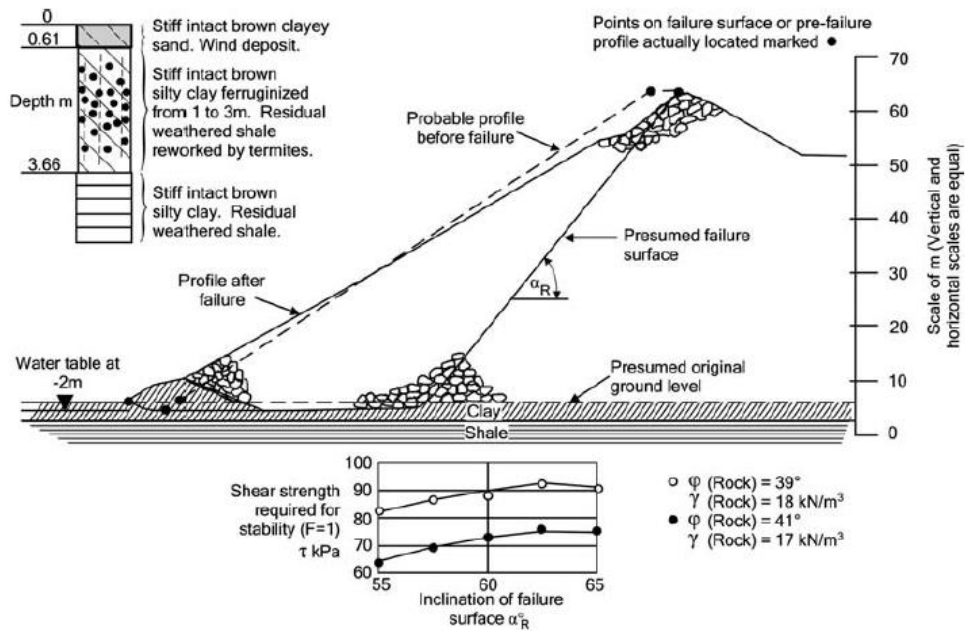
Failure of a waste rock dump along a horizontal plane (Blight 2009)
